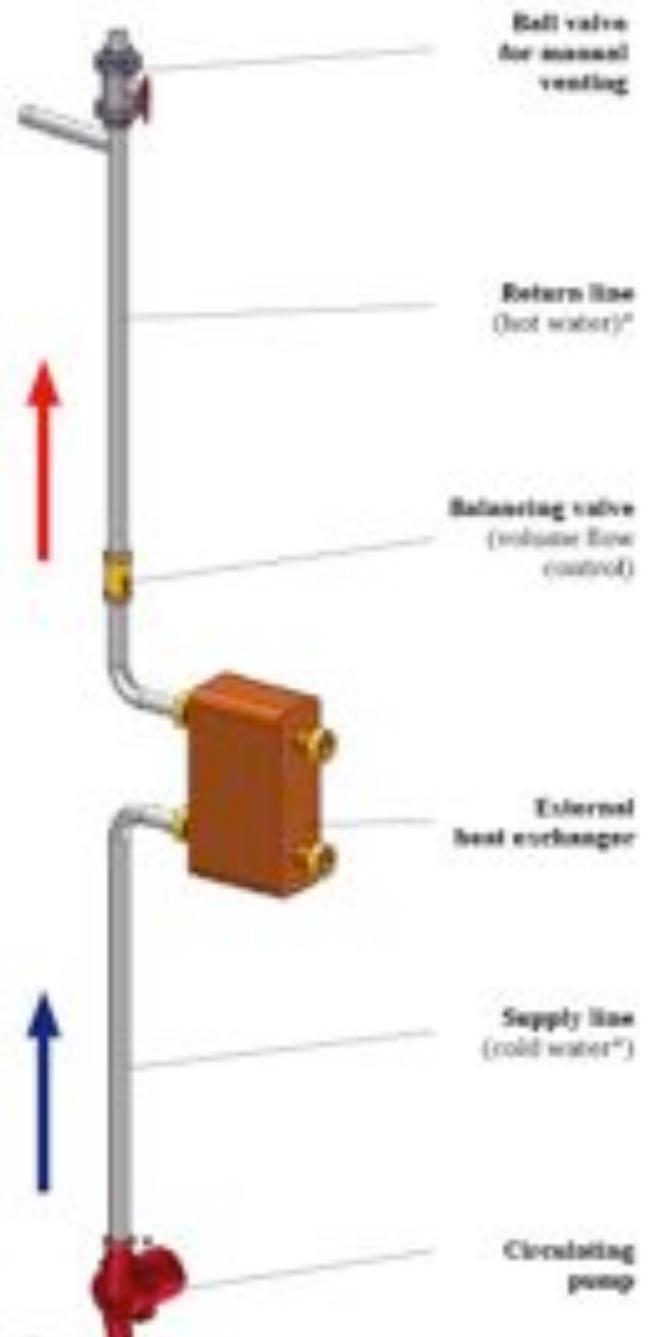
Connection assembly for buffer accumulator and layer addition system (loading) (This connection assembly design represents a non-binding example and must always be verified by the customer.)
